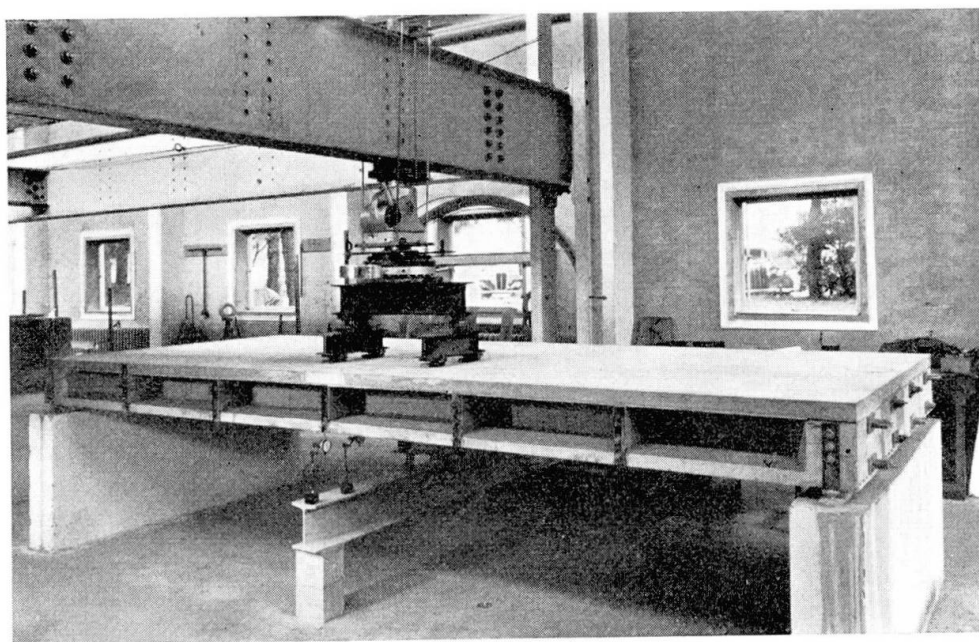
Box-Section Bridge — General View of Second Bridge.
